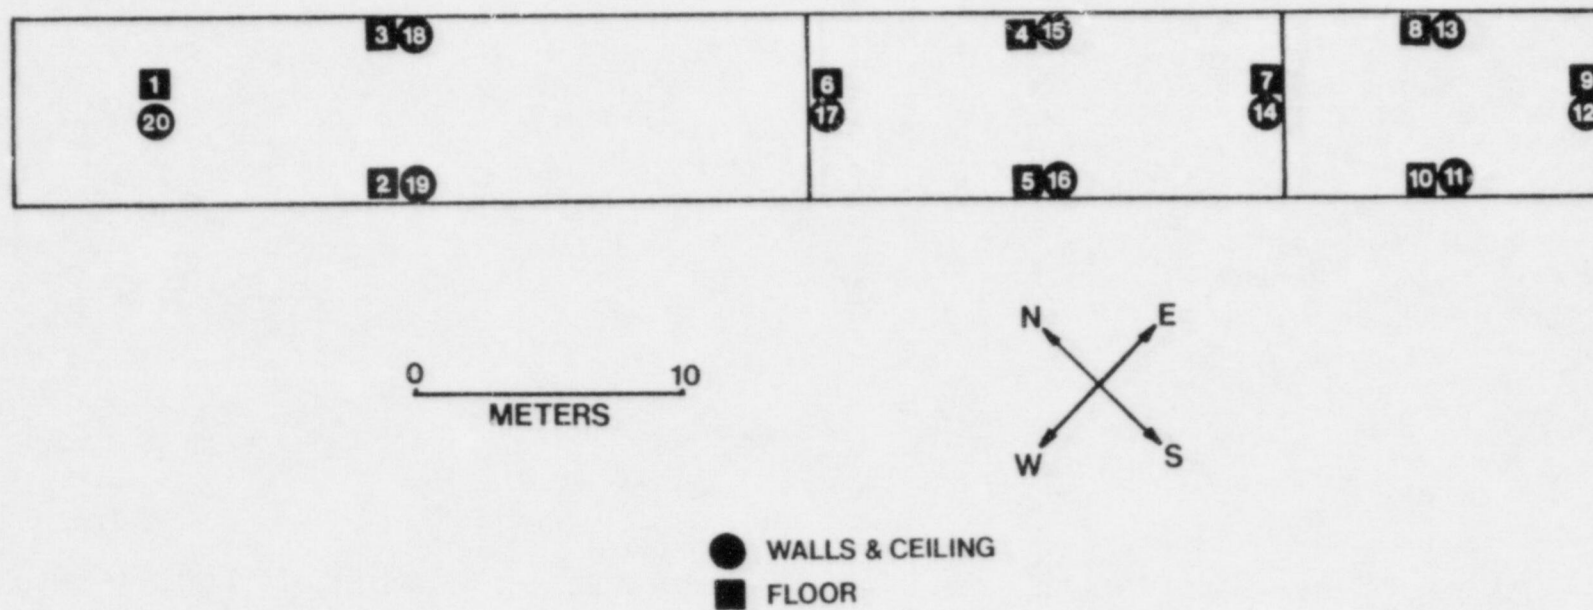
Floor Plan of the Cobalt Building Indicating Locations of Measurements and Smears
